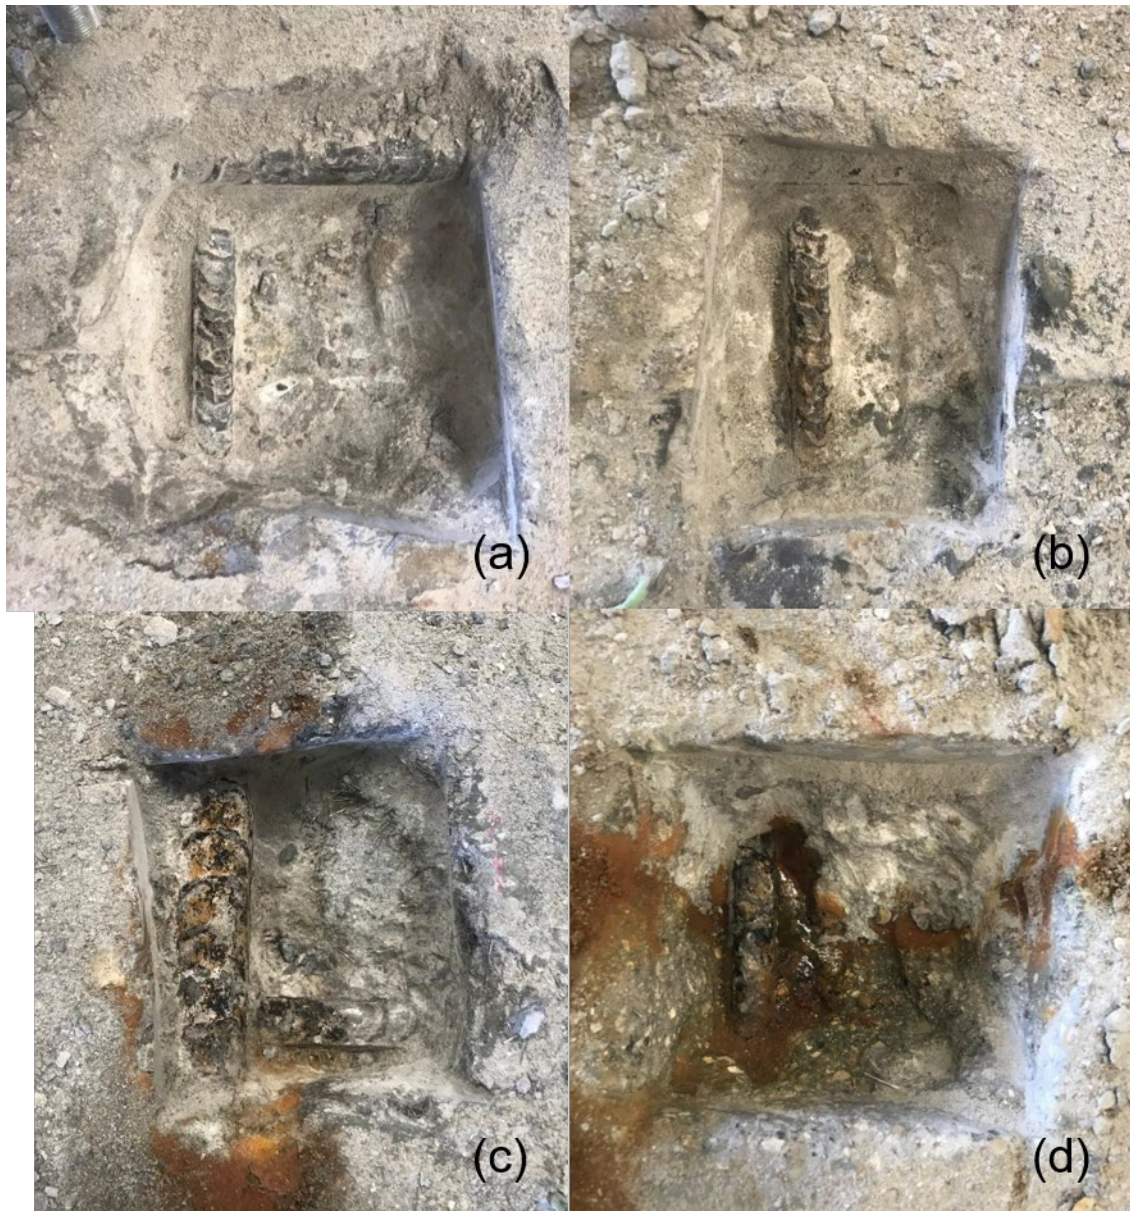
Fifth rebar excavation for large-scale corrosion specimens using (a) ODOT AA, (b) J3, (c) Ductal[®], and (d) Phoscrete[®] after 24 hours
